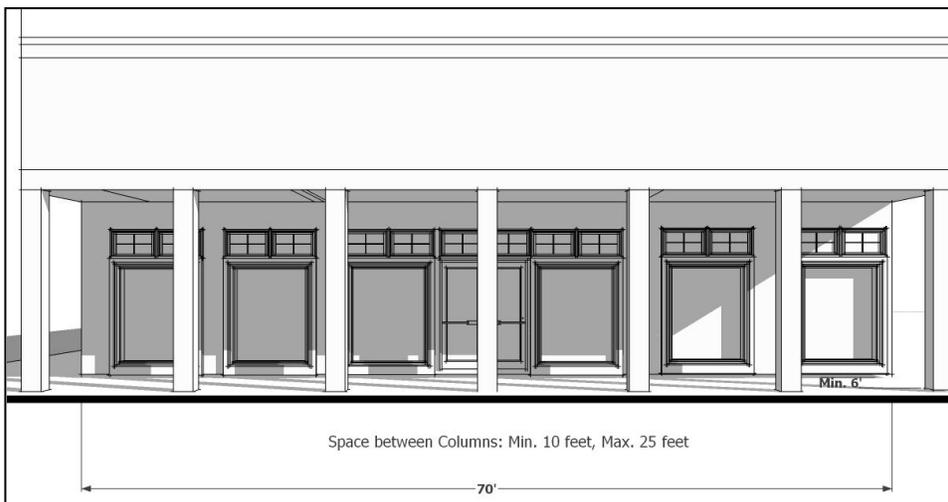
Arcades create a semi-public transition from the sidewalk to the building
